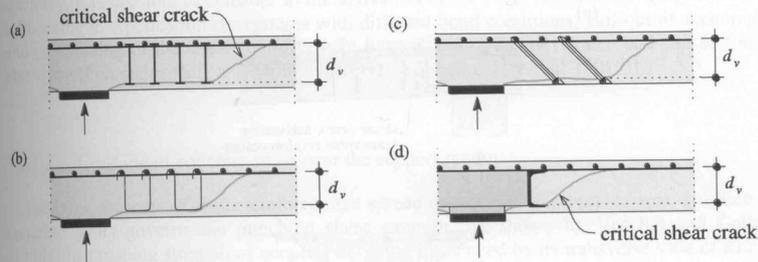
Effective depth outside the shear-reinforced zone as a function of the punching shear reinforcing system: (a) studs; (b) stirrups; (c) bonded reinforcement with anchorage plates; and (d) shearheads
